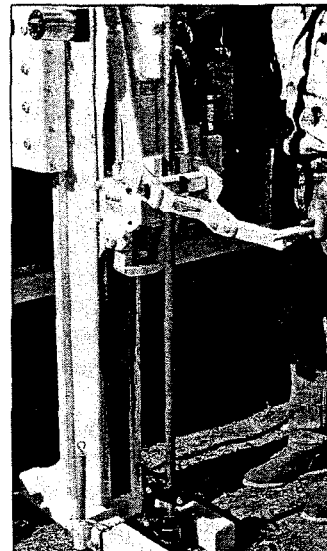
Raise the inner rod string using the probe hammer and a Rod Grip Pull System if rods are too heavy to lift by hand.
